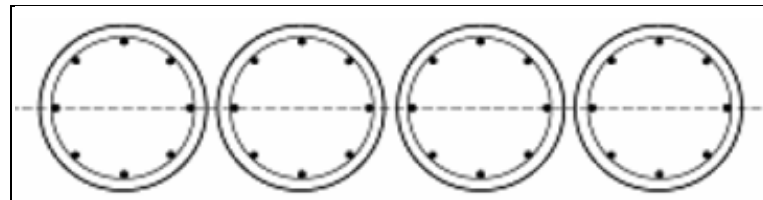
Pile wall-Contiguous cross-sections [11]
